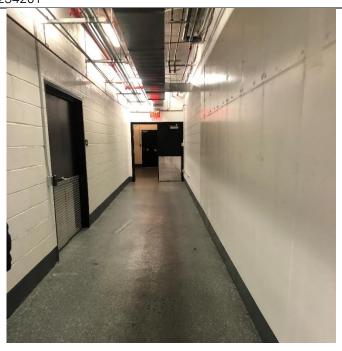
View of foundation slab in the tenant storage room in the sub-cellar of 626 First Avenue; facing west. Dated 12/20/2019.
